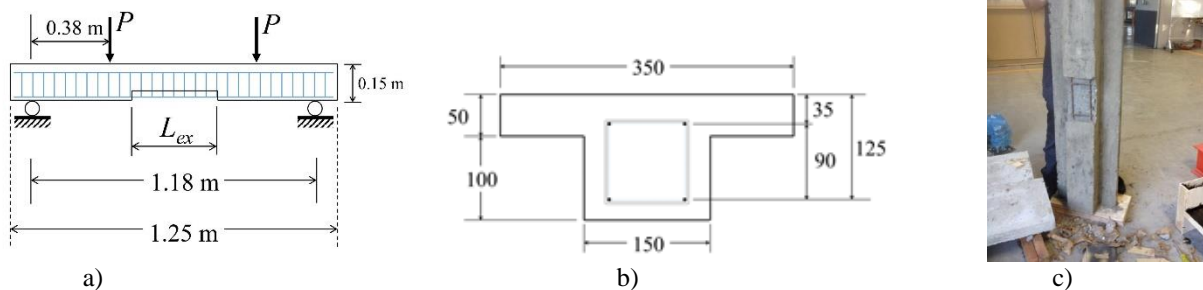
a) T-beam testing setup, b) T-beam cross-section (dimensions in mm), and c) Picture of one of the two $L_{ex} = 0.20$ m specimens (with 17% of reinforcement exposure).
